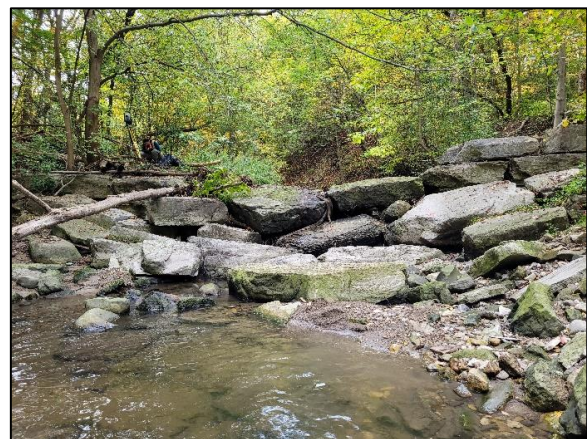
Armourstone Grade Control Structure Downstream of Exposed Sanitary Sewer Crossing
